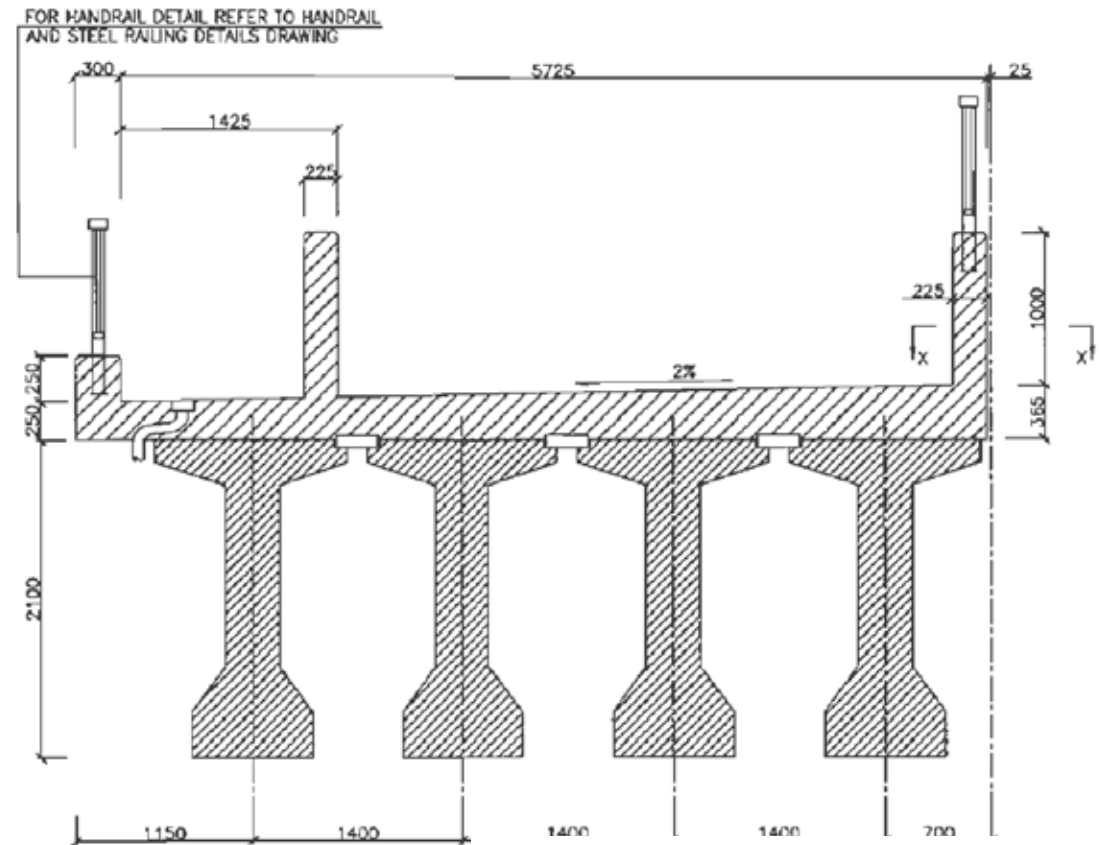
Cross-section of girders and deck – the bridge includes a reinforced concrete slab with a walkway (left).
